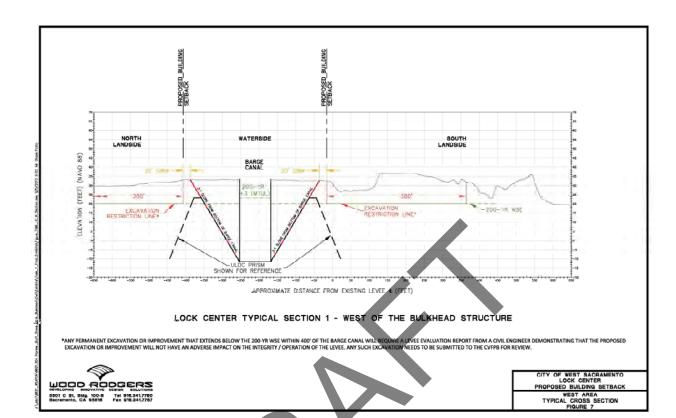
Locks Center Neighborhood (West) Typical Cross-section
